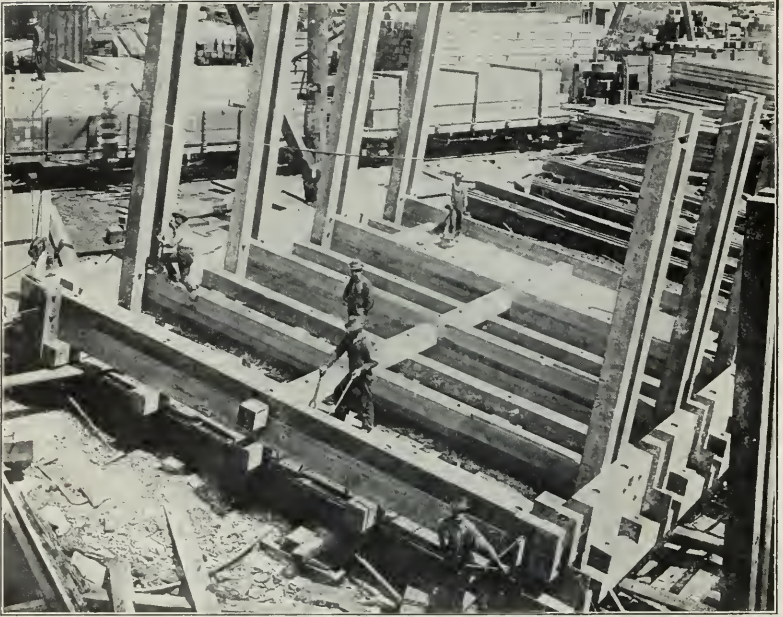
BUILDING A TIMBER CRIB FOR BREAKWATER CONSTRUCTION, SHOWING THE MANNER OF FRAMING AND FASTENING.
